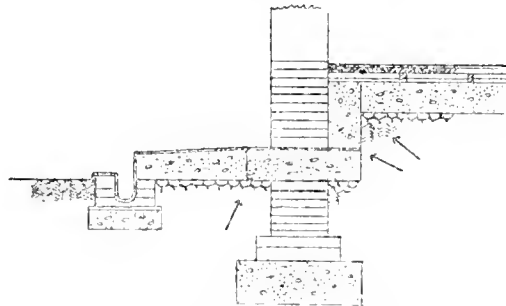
Detail of termite-proof construction; the protective layer at two levels.
